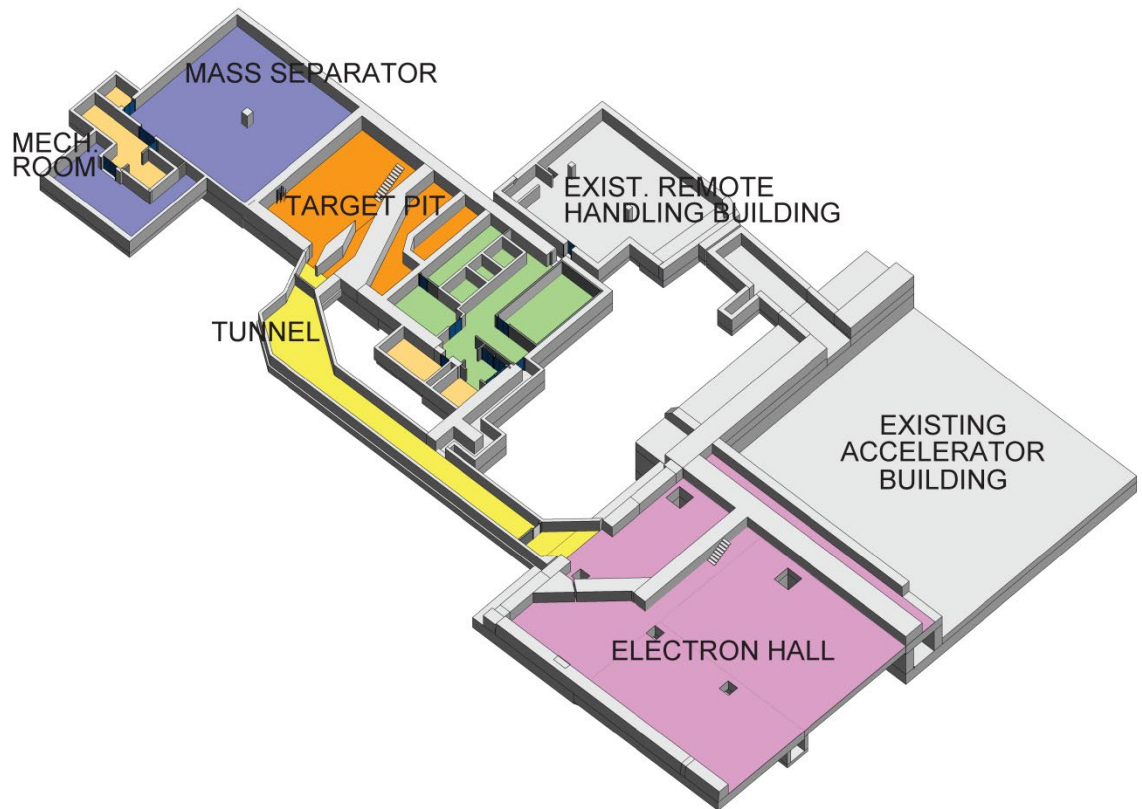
Architectural Plan at the B2 Level of ARIEL
